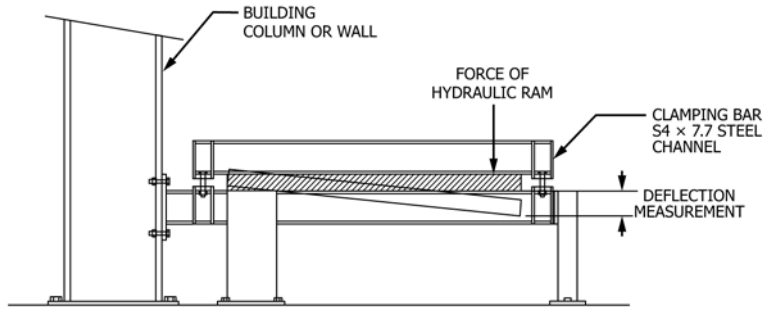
Section A-A from Fig. 10 Rack Test Fixture
